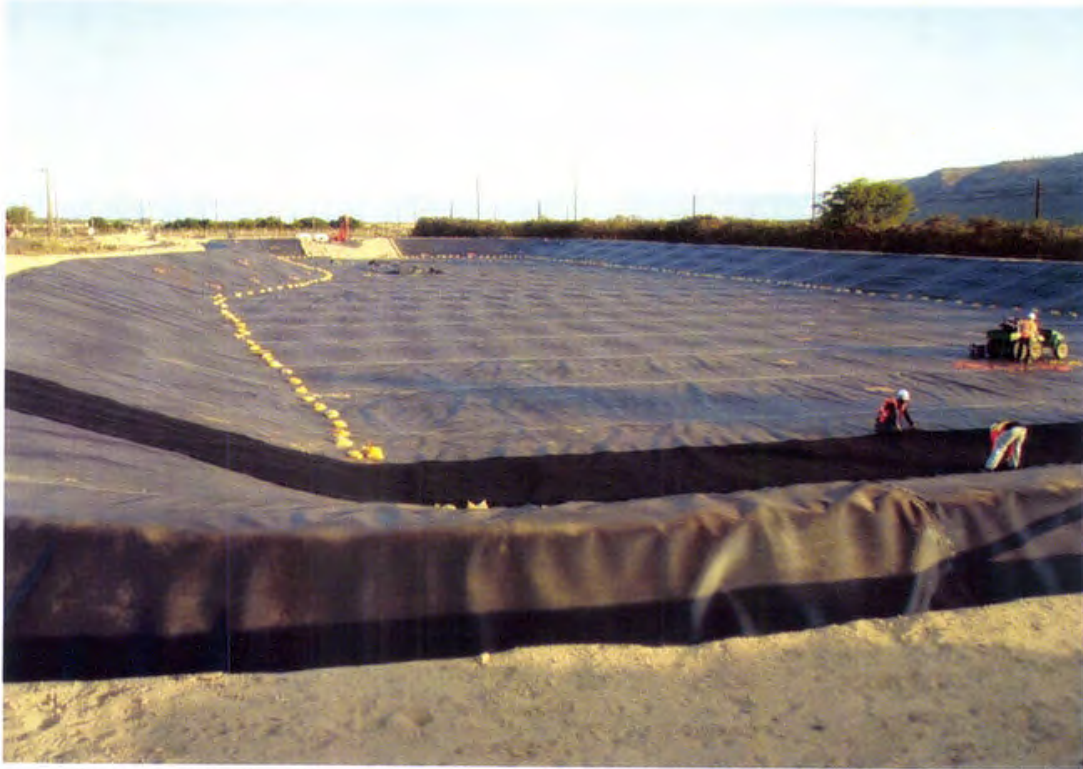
Installing 16 oz/sy nonwoven cushion geotextile above the completed primary 60 mil HDPE geomembrane (looking west)
